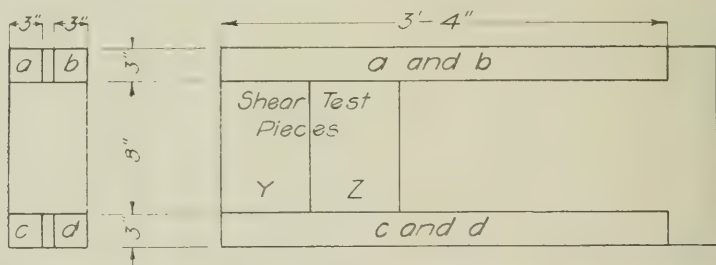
LOCATION OF MINOR TEST PIECES IN FULL-SIZE STRINGERS.
